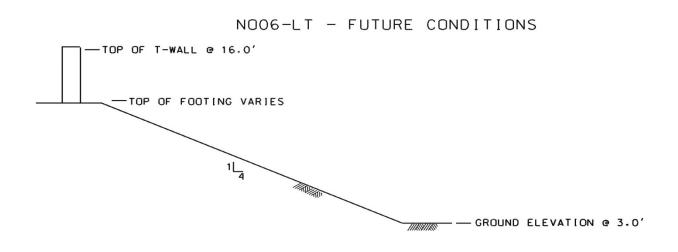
Typical Levee Design Cross-section Topaz Street Levee (NO06-LT)
